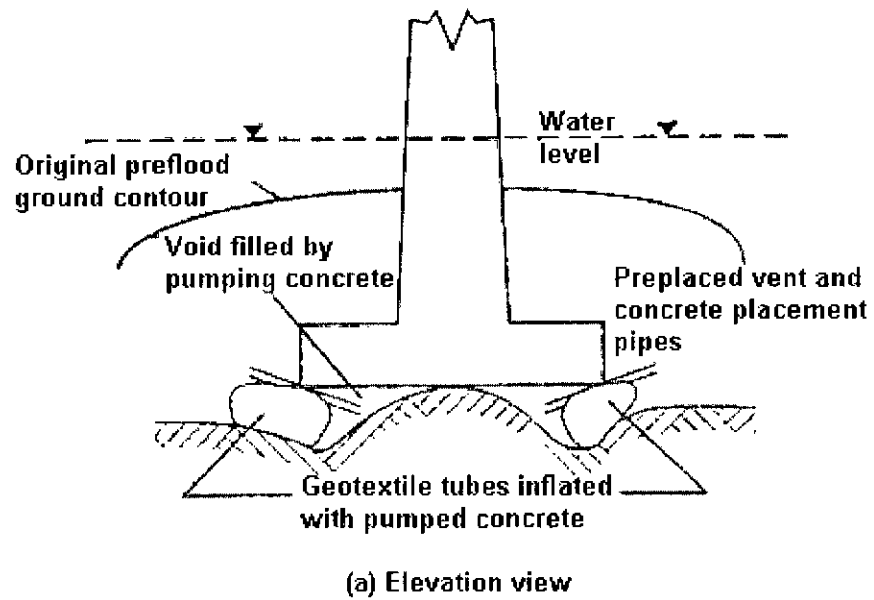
Underpinning of scoured bridge pier using grout-filled geotextile (after Koerner, 1997)
